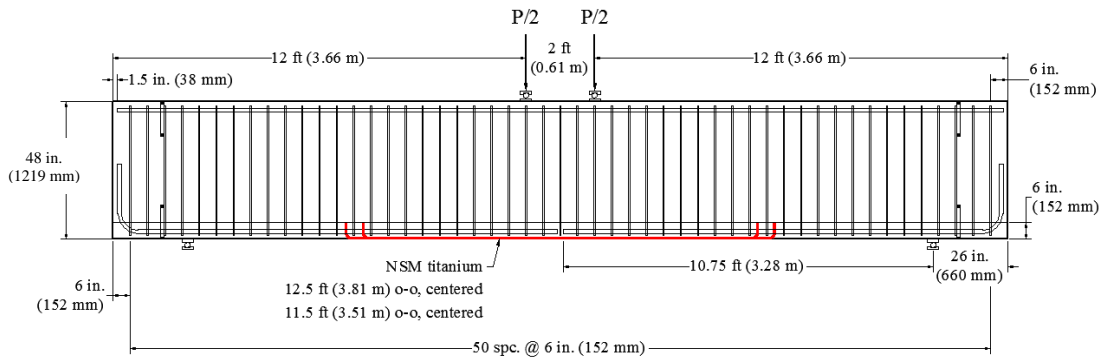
Elevation of specimen IT.0.0(6).Ti.
